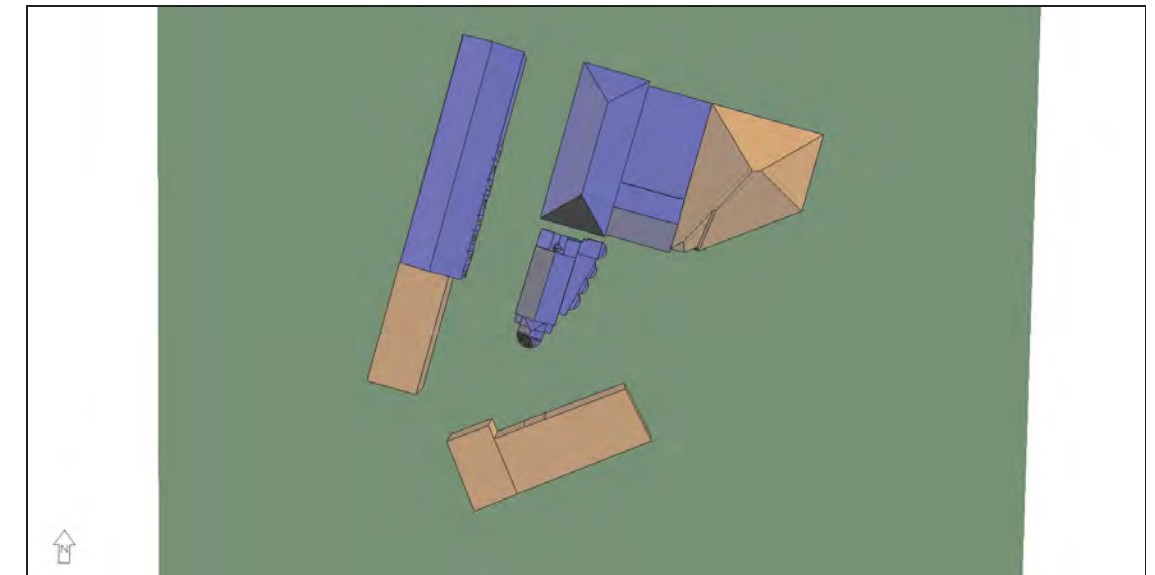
3D Model image showing existing Mission Gallery and critical adjacent buildings, namely the south-facing façades of Gloucester House and Marina and the facing residential buildings of Gloucester Place.
